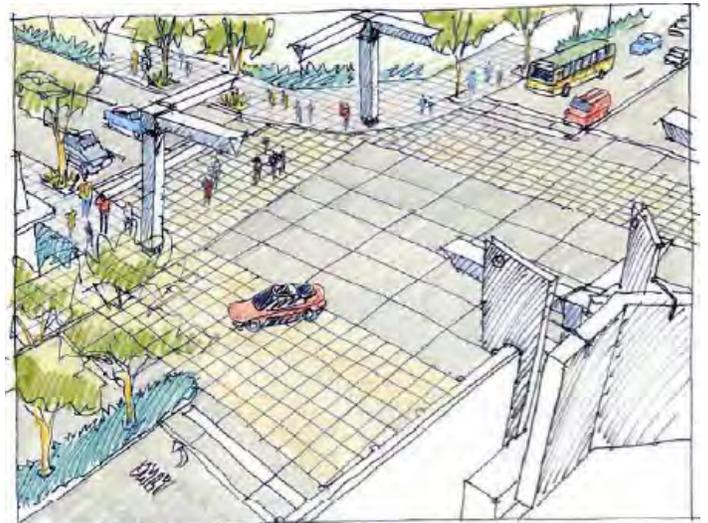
Stanchions Concept for Northgate Way & 5th Ave, 2004 Northgate Open Space & Pedestrian Connections Plan
